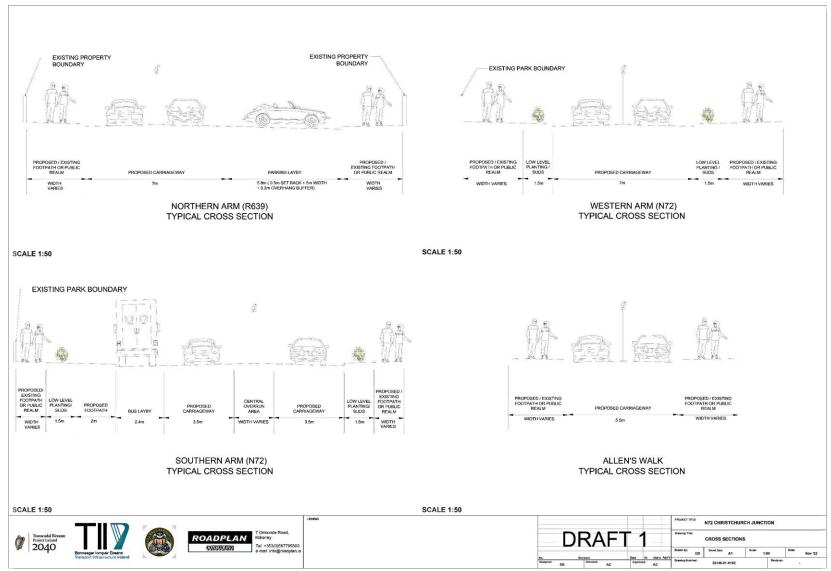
Proposed Cross Sections (RoadPlan Consulting, Drawing No: 22148-01-0102)
